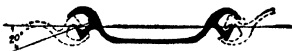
Standard sheet piling (Jones & Laughlin Steel Co.).
